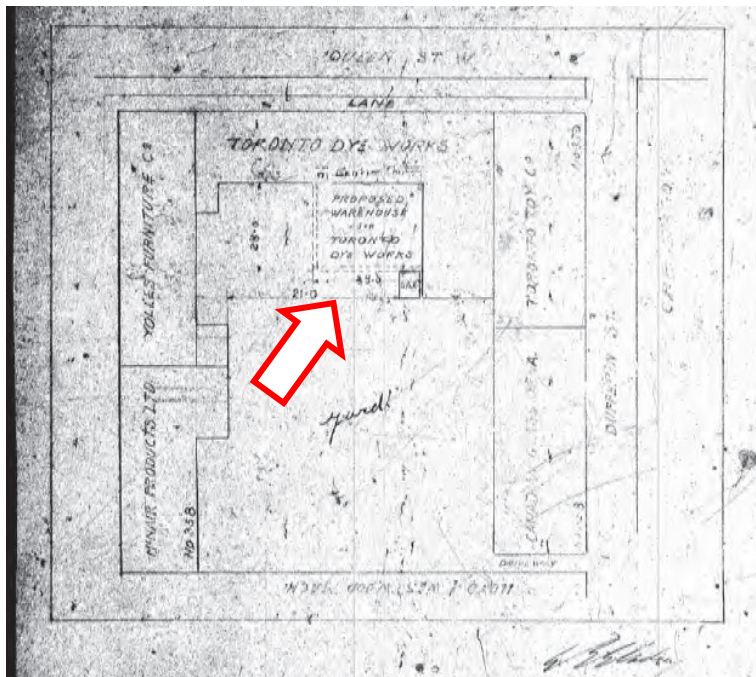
1948-1949 site plan drawing showing proposed Toronto Dye Works addition on the south side of the property at 376R Dufferin Street (City of Toronto Archives)
